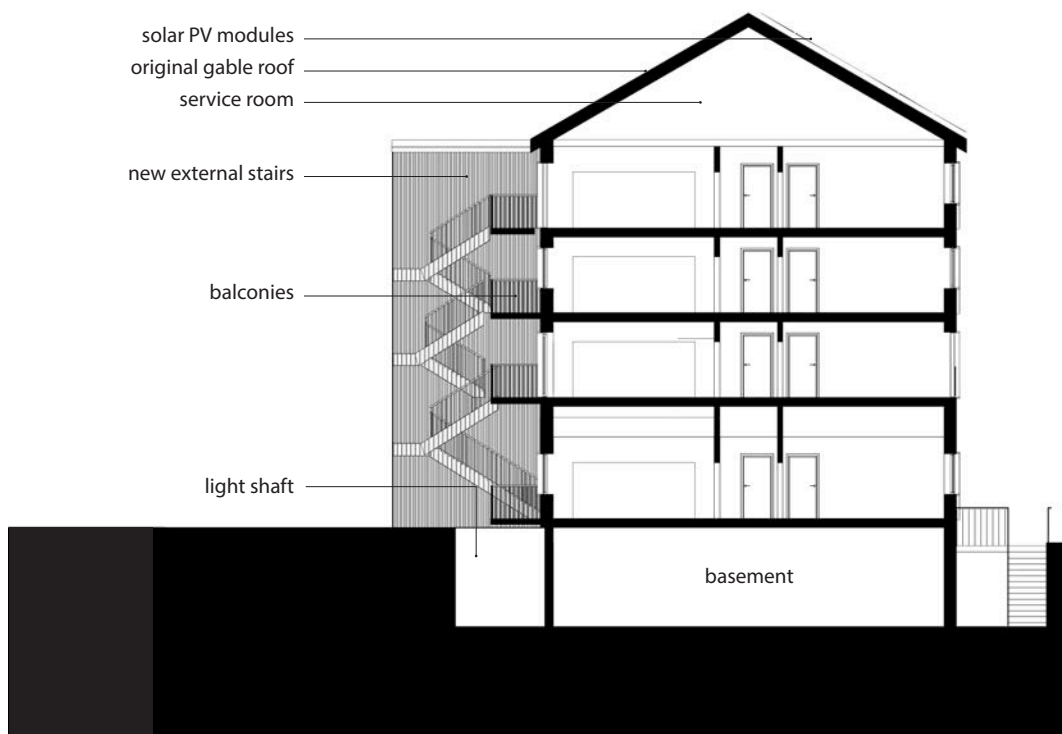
Sems Have, Block A. Section and south elevation (1:250)
